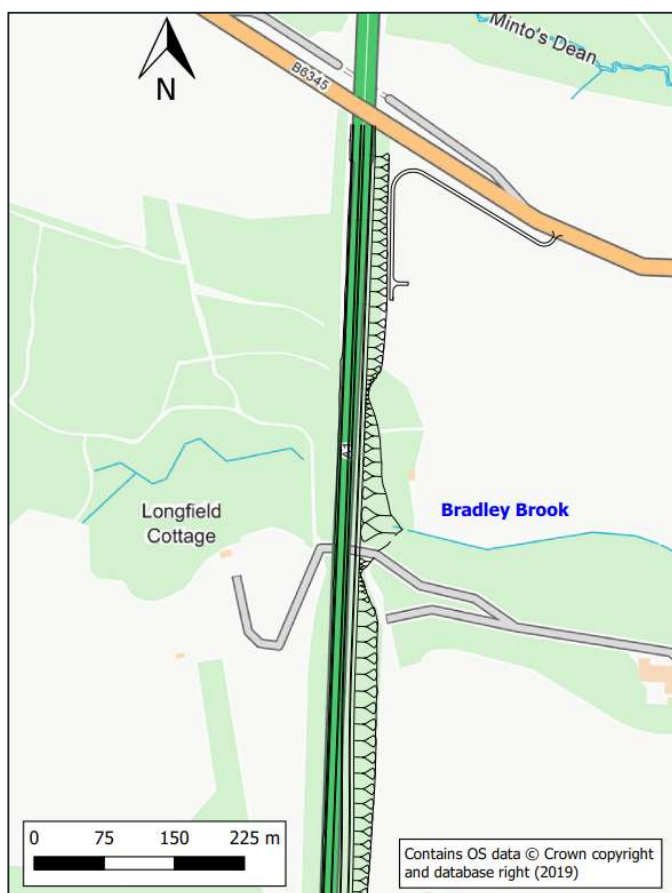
Bradley Brook Proposed Culvert Extension
